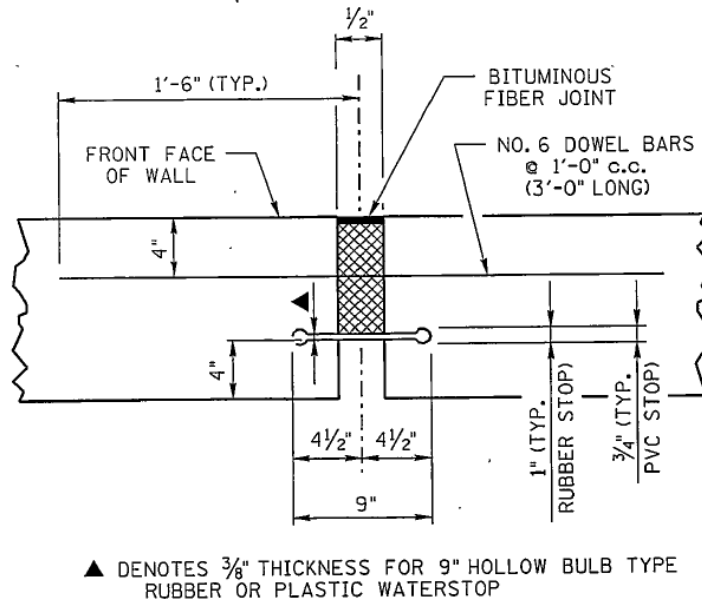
TDOT Vertical Wingwall Expansion Joint (TDOD 2000d)
